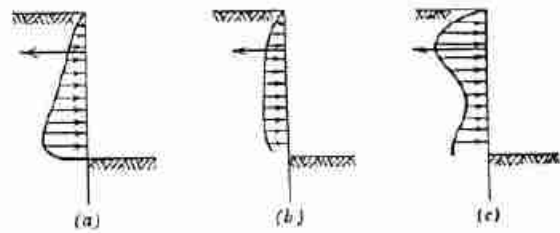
Relation between construction procedure and stress distribution against anchored bulkhead. (a) Backfilling. (b) Dredging with normal yield of anchor. (c) Dredging with unyielding anchor.
